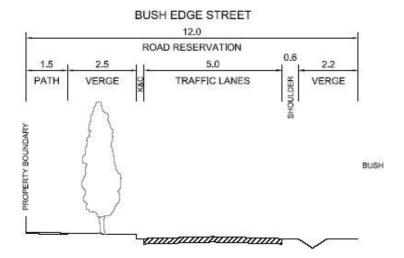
(e) Port Sorell and Environs Street Cross-section designs - Bush Edge Street
